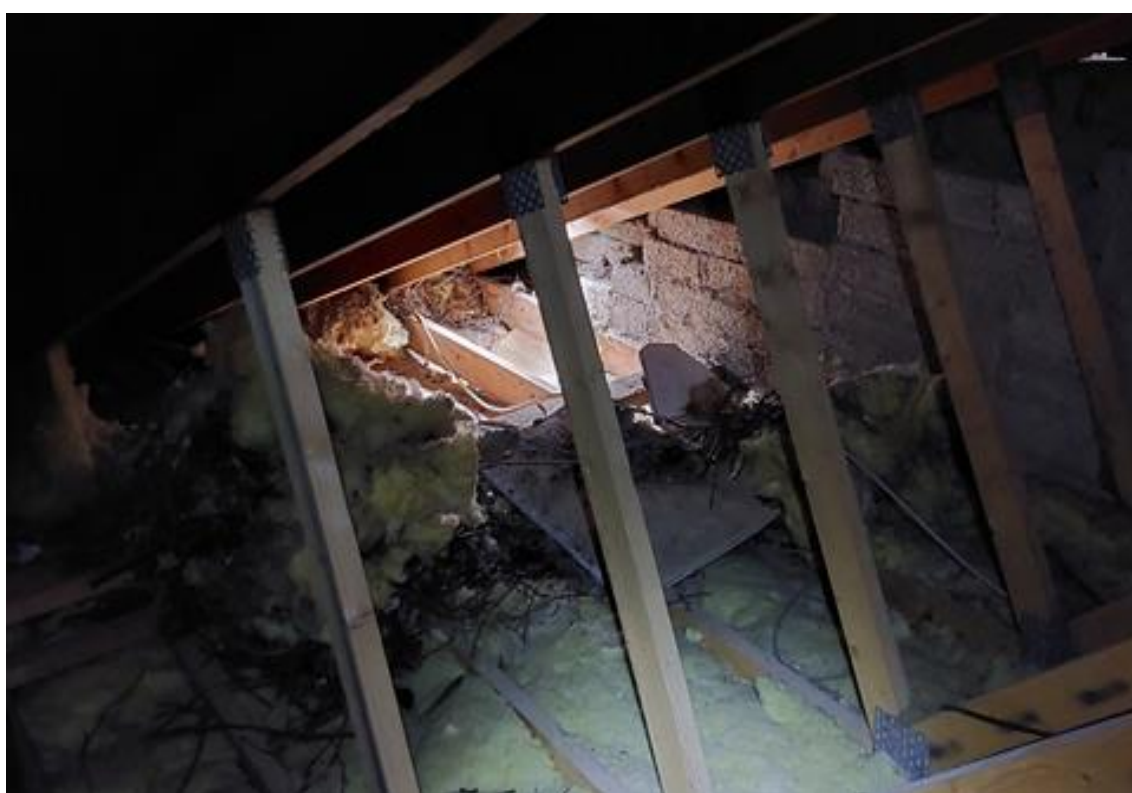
Internal view of the area which needs repairing of both roof and ceiling
